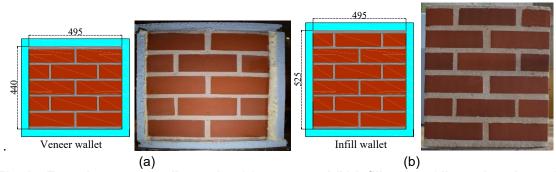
Tested masonry wallets using (a) veneer and (b) infill mortar (dimensions in mm)
